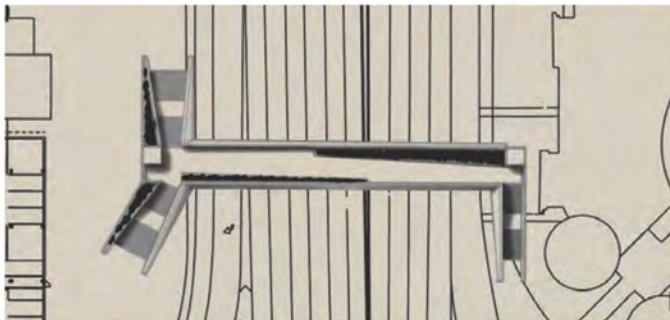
Plan view of Concept 1, the triangulated steel girder option.
